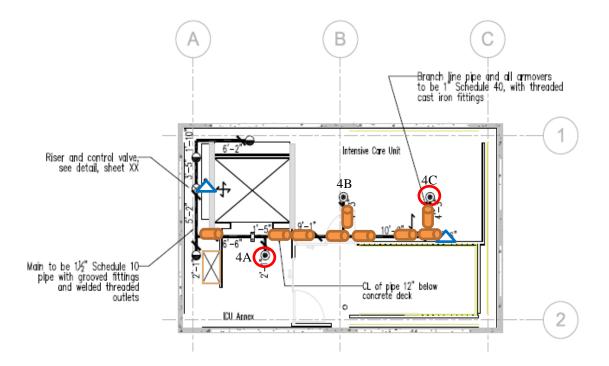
Floor 4 sprinkler system design layout and specifications
